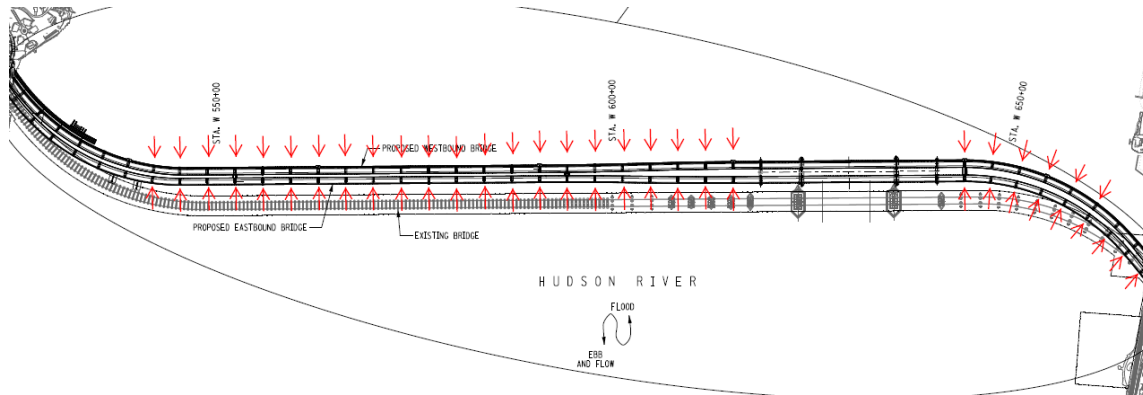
Approach Structure Layout (arrows indicate precast pier cap locations)
